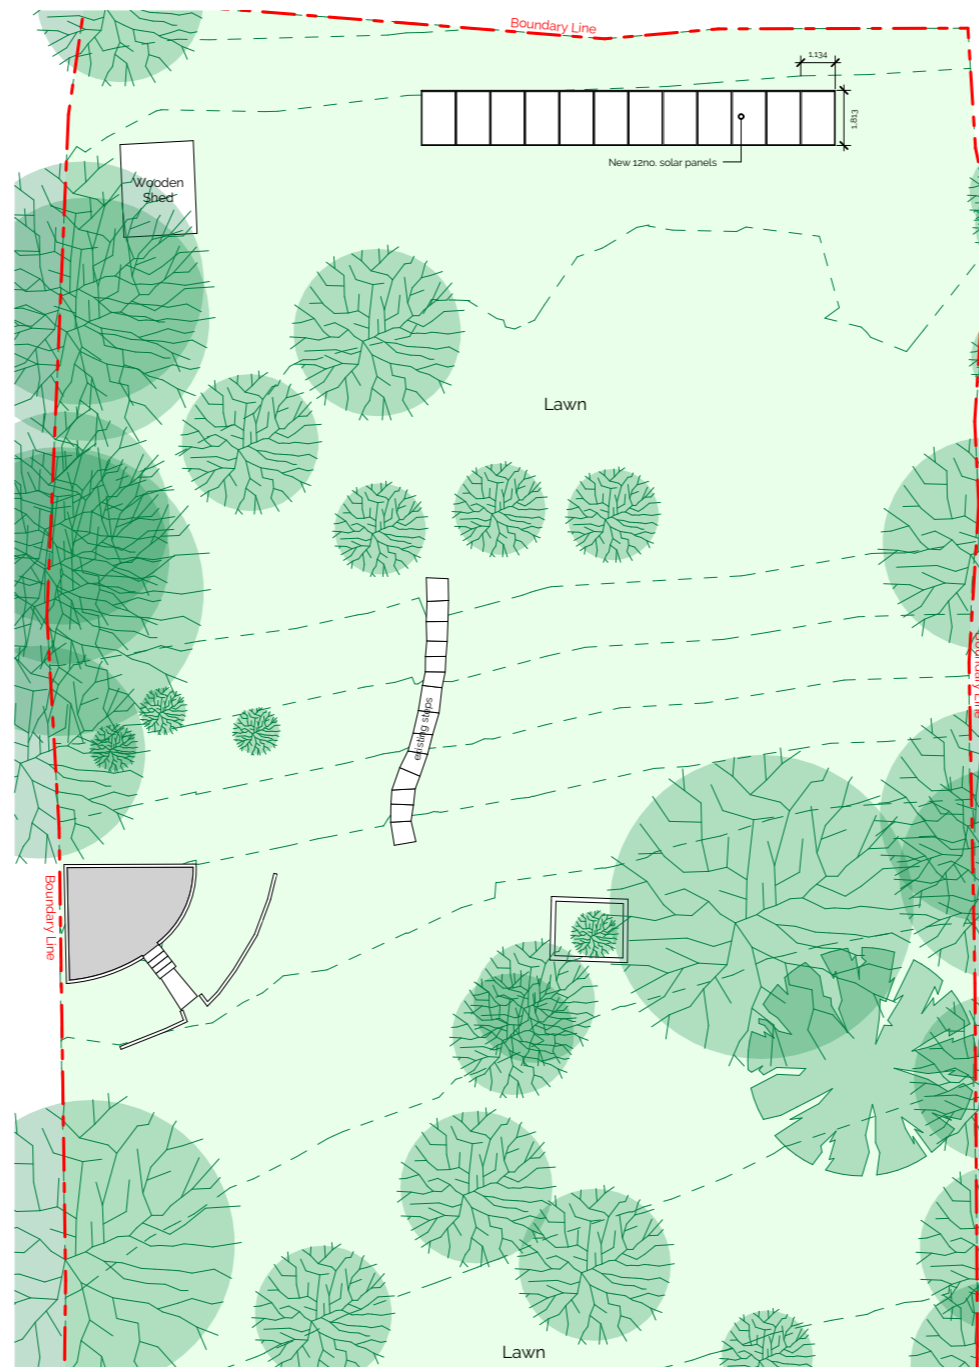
71 Leeson Road Proposed Part Site Plan - Not to Scale
